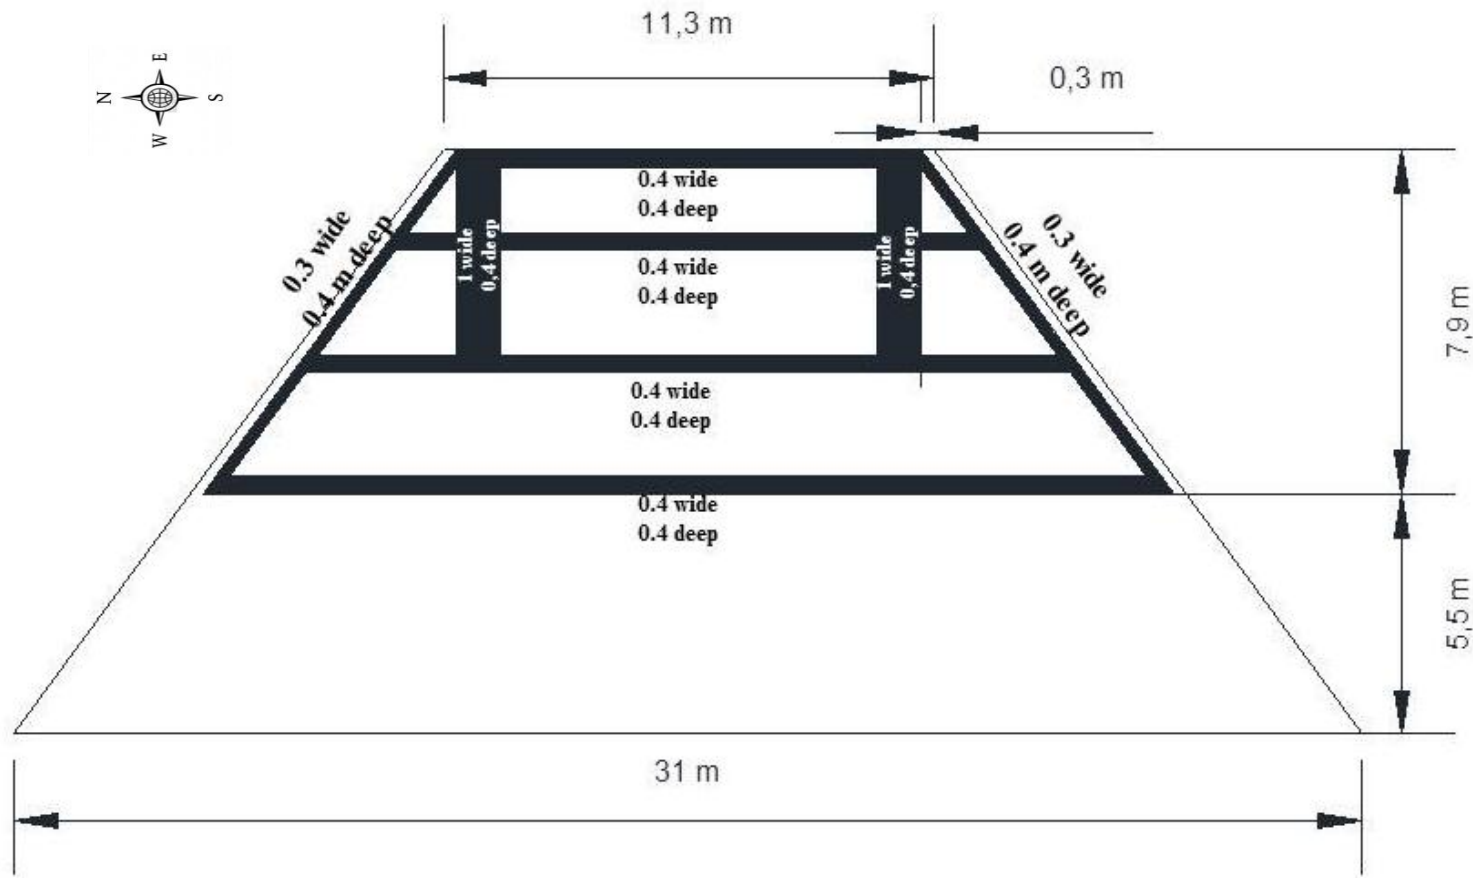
Pentagon Road Bridge Span 4 beam plan view
